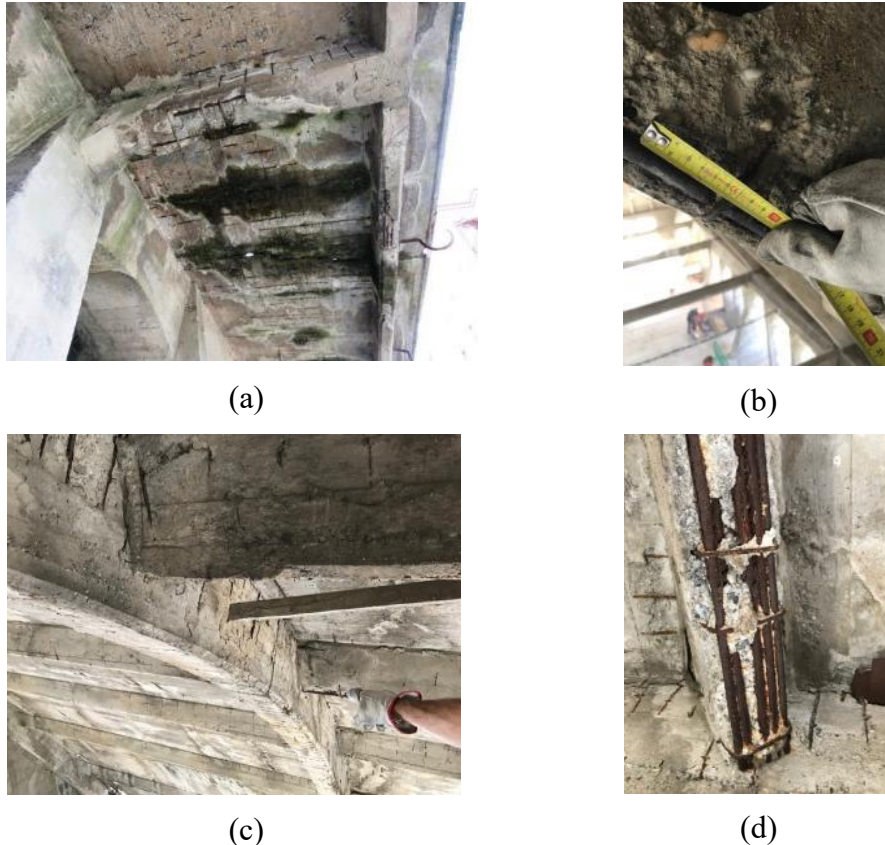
Structural deterioration and damage: (a) water staining and bio growth on the elements; (b) a detail of the exposed bars of a parabolic arch; (c) exposed bars on the arches; (d) exposed bars and detachments of concrete of the roof elements (Lenticchia, Miraglia, Quattrone, & Ceravolo, 2021)
